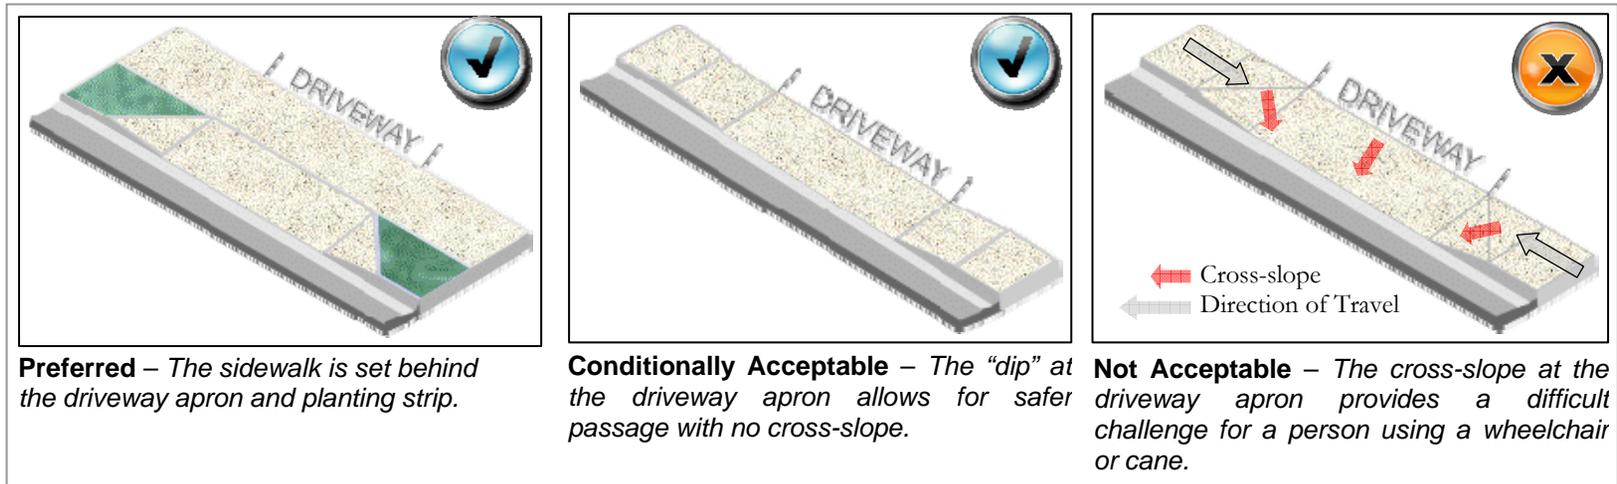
Examples of acceptable and unacceptable design solutions for minimizing cross-sloping at a driveway and sidewalk interface.
